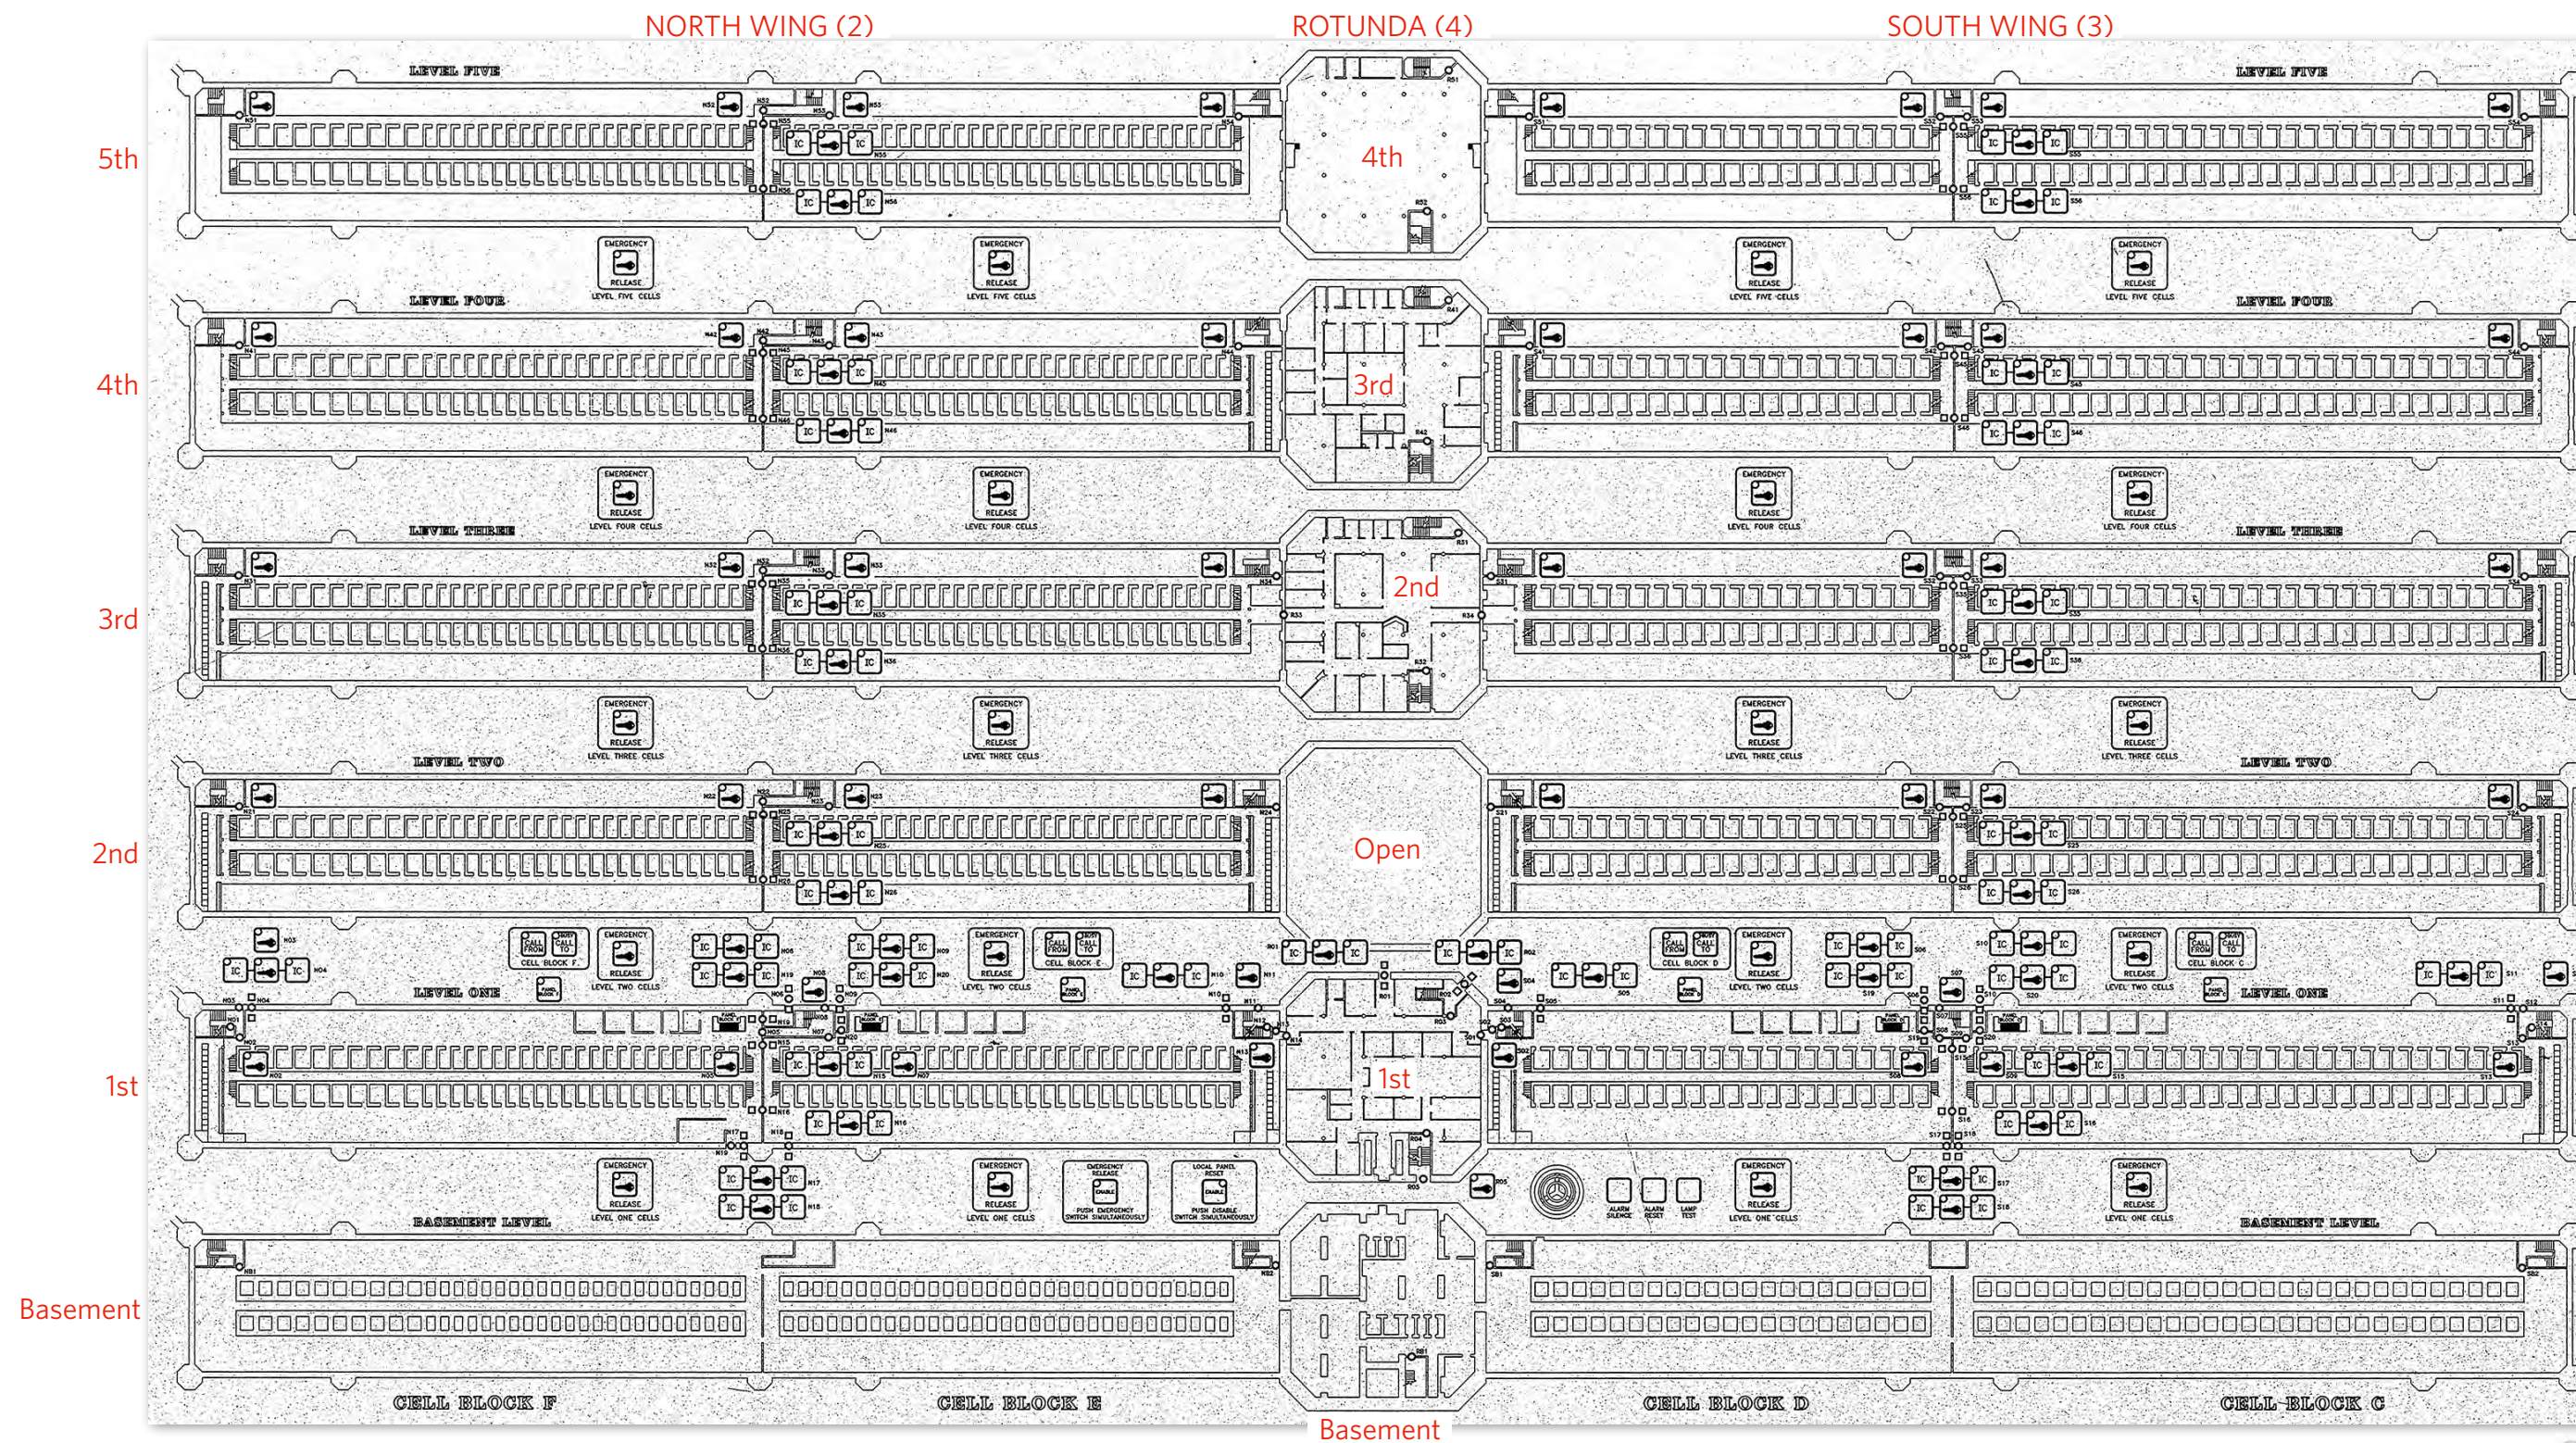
1993 floor plans of Main Penitentiary Building—from the project that replaced the cell doors and provided centralized control of the doors (SCI-Pittsburgh Facilities Archive).
